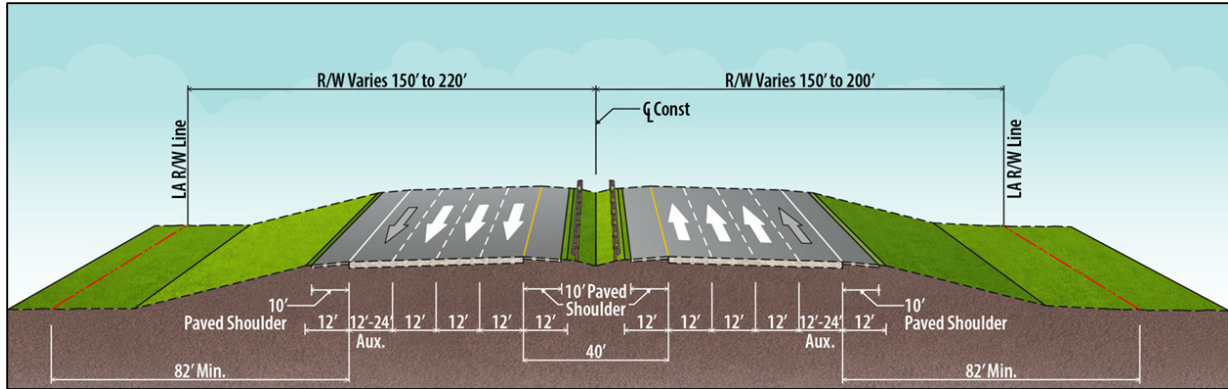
Existing I-275 Mainline Typical Section from Roosevelt Boulevard to south of 9th Street North (Segment C-2)
